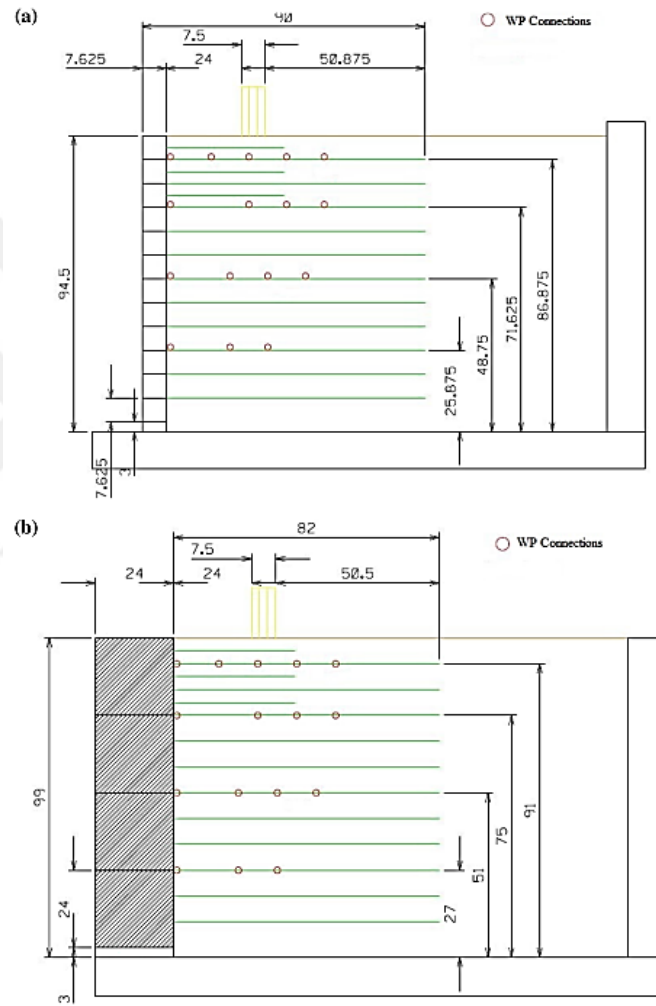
Cross-section of a) Concrete masonry unit model and b) Large solid concrete block model (Doger & Hatami, 2020)
